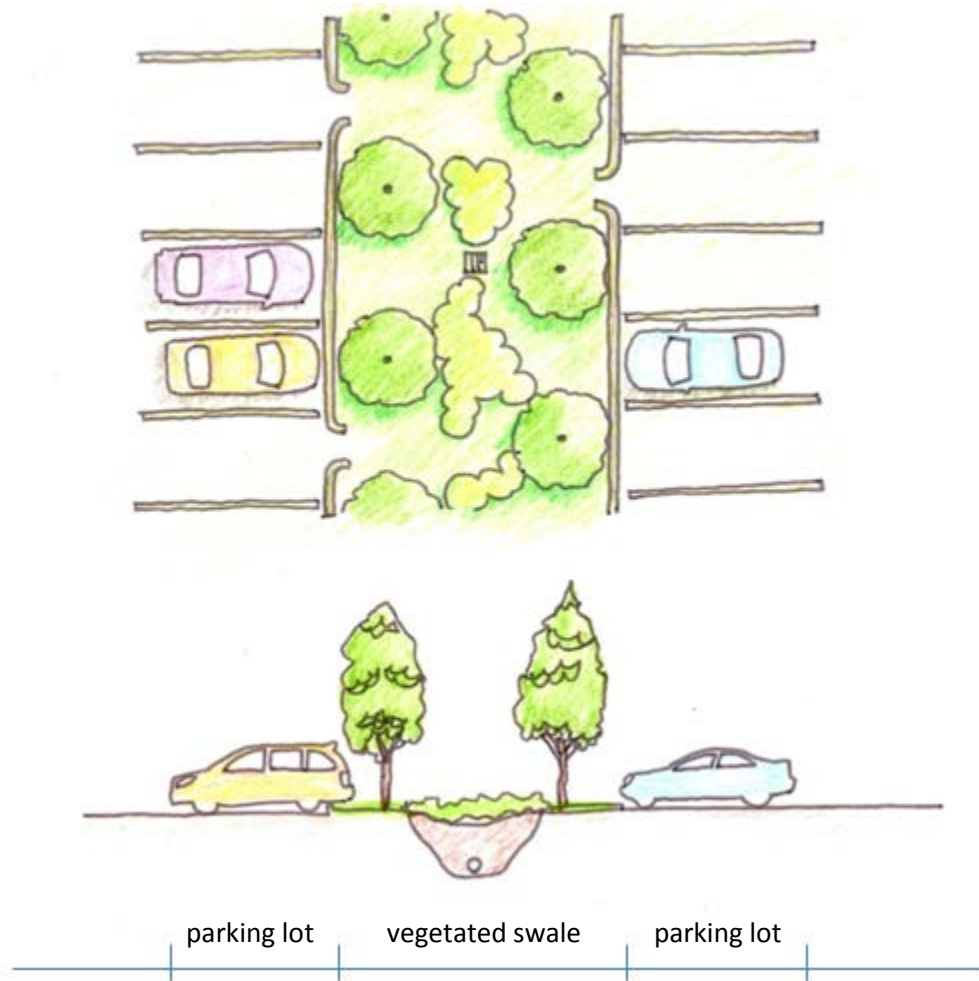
Plan and cross-section illustrating the parking vegetated swale
